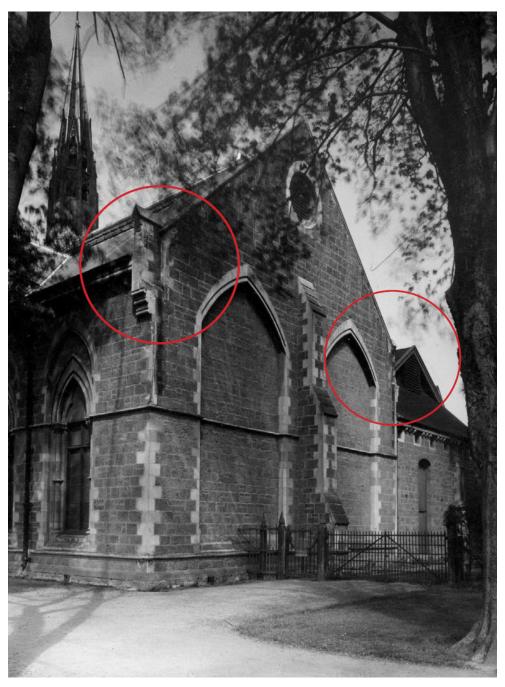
1877 Mountfort Building, north wall pre-1958. The central buttress has been demolished with the construction of the 1958 building, however all evidence suggests that all of the remainder of this façade will be able to be revealed to the public as part of the redevelopment, including the corbel detail (within right-hand circle) (original image source: Canterbury Museum archives)
